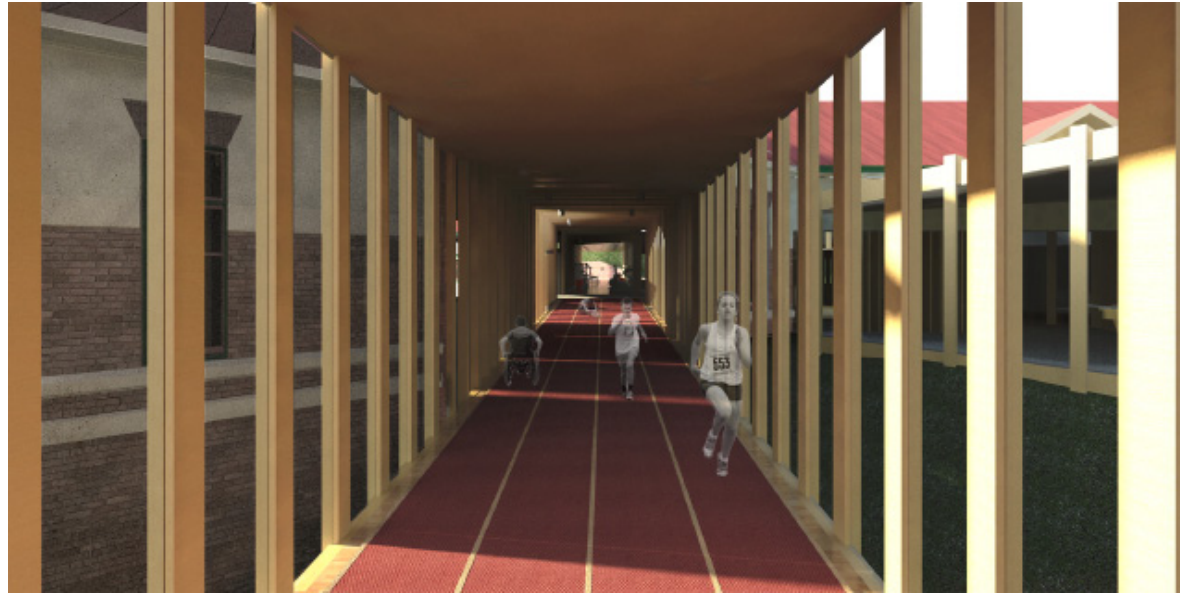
Looking along running track intervention towards existing building. Lounge to right.
